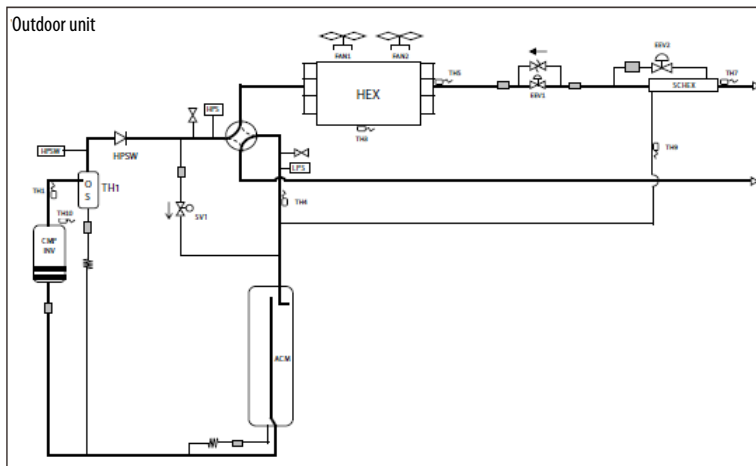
Cooling circuit of air handling unit of air handling unit size 0800.
